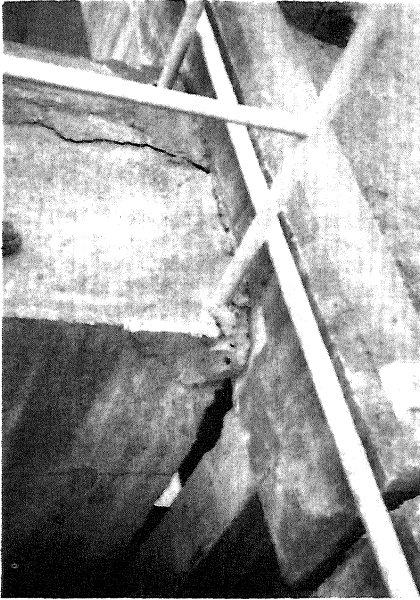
Tarik dam. Pounding failure in the concrete piers.
